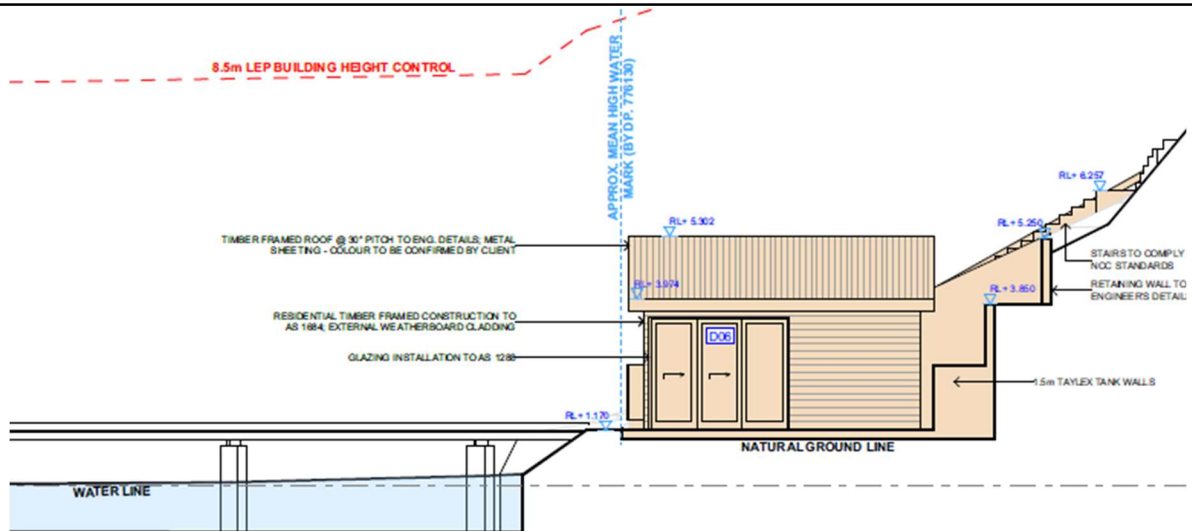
South Elevation of Proposed Boat Shed (extracted from plans by Action Plans (2021, provided in Appendix B))
